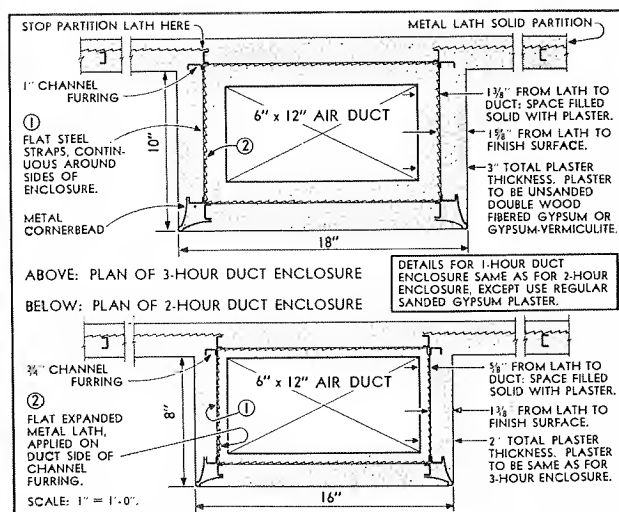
Typical Details for Fire Protection of Sheet Metal Ventilating and Heating Ducts.
